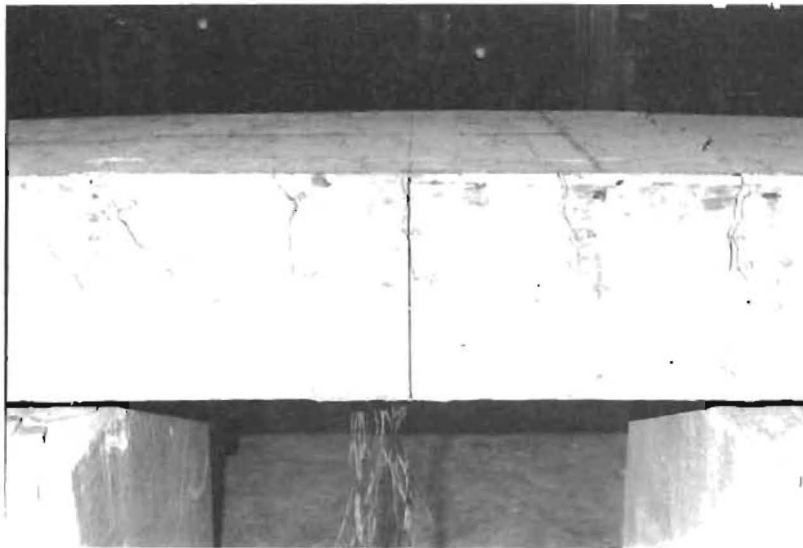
Side view of 8-36-4/1/4-6/6 after failure
